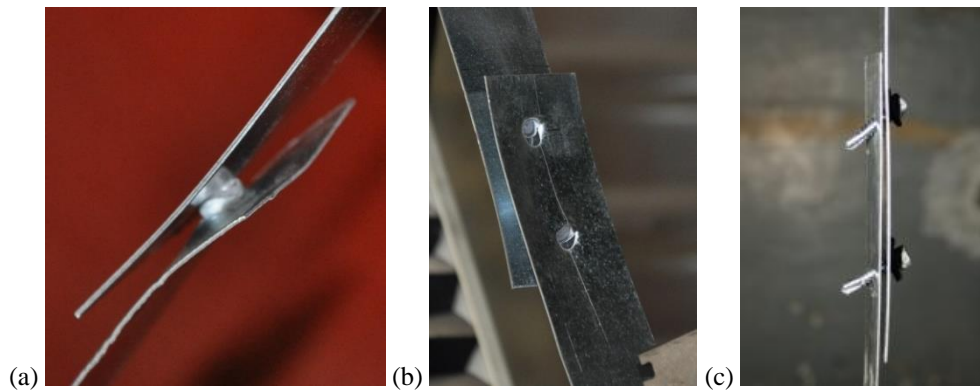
Specimens at failure: SW1-1.4 (a) one spot of welding; (b) two spots of welding; (c) Specimen T1-1.4 with self-drilling screws
